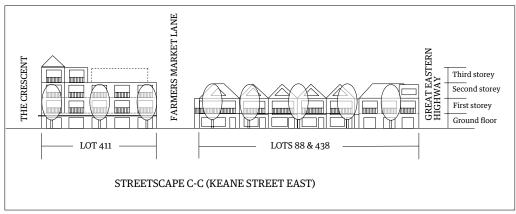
ELEVATION FOR SITE H FROM KEANE STREET
